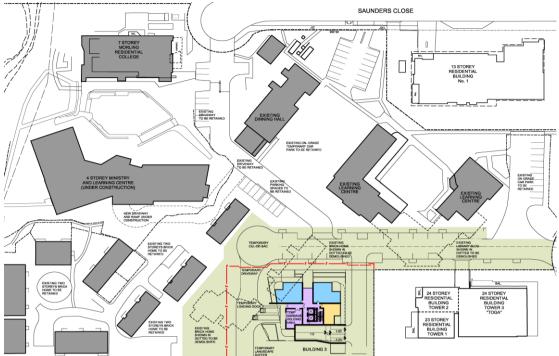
Scenario 1 – Construction of Building 3 with Road 3 being half constructed.
